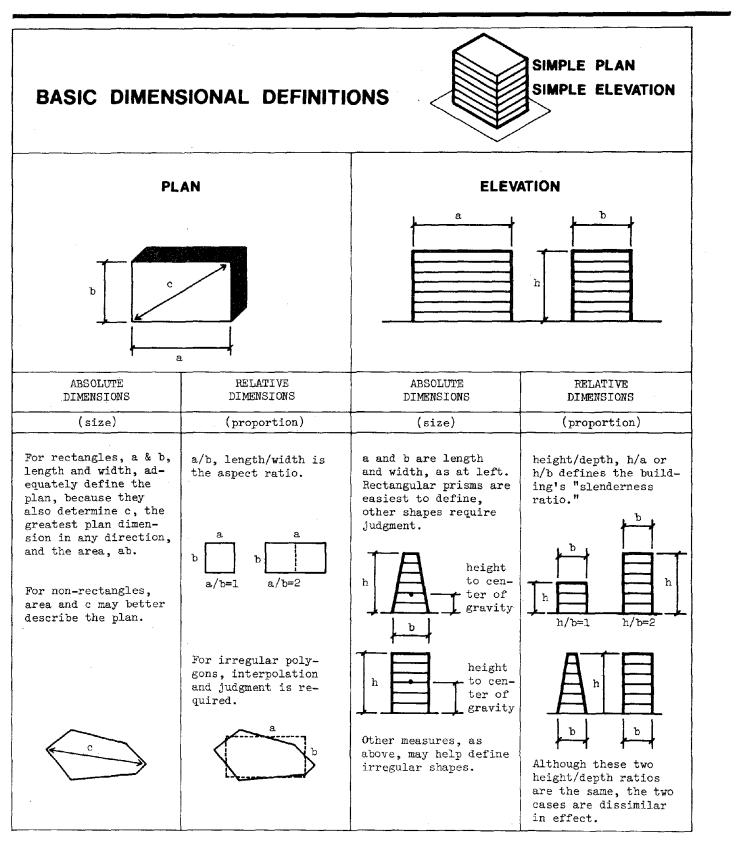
Simple plan/simple elevation: basic dimensional definitions.
